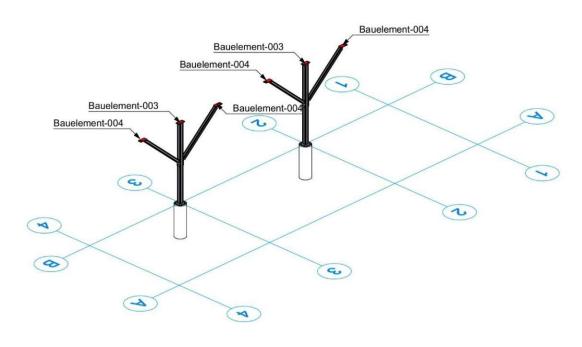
Step 6 - The connections between bracings, columns and the beam above are assembled and aligned
